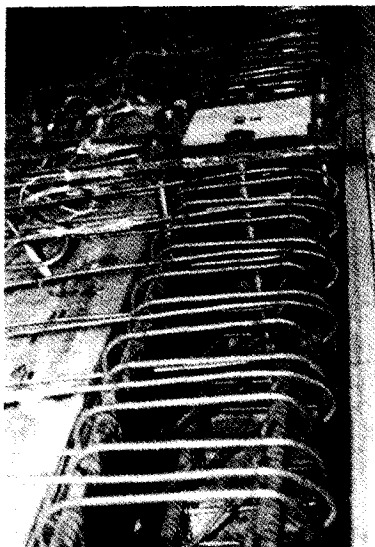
Longitudinal and transverse reinforcements in spandrel beam.
